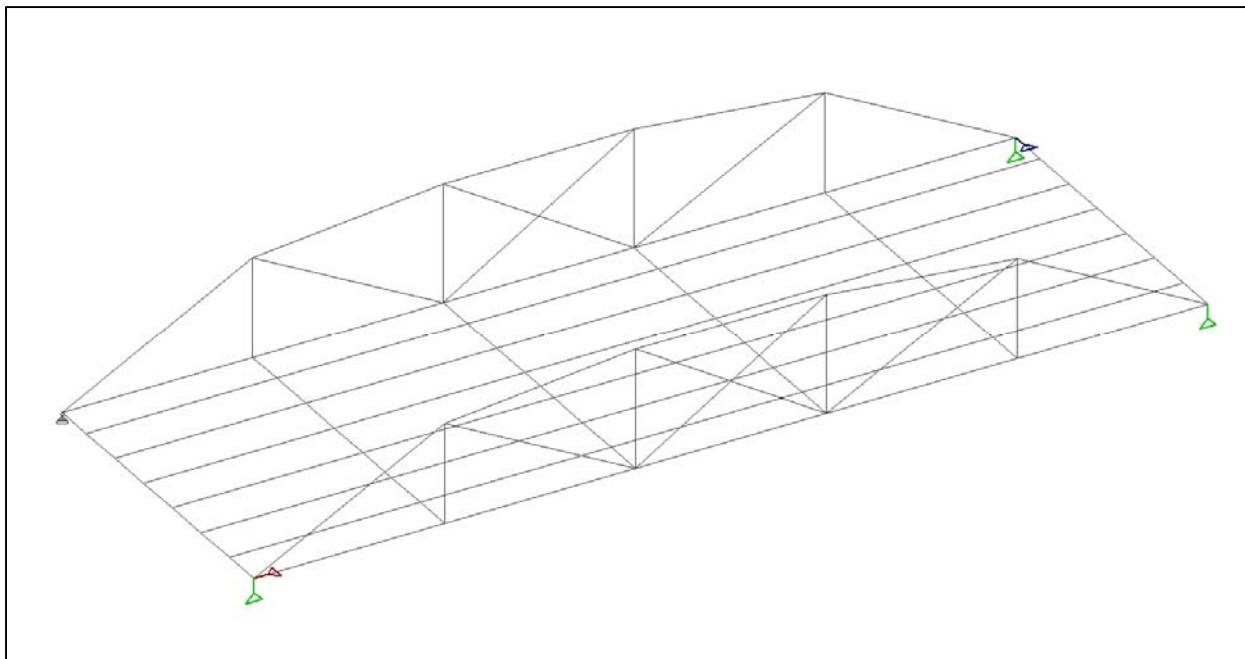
STAAD.Pro Model of Pony Truss Approach Span
